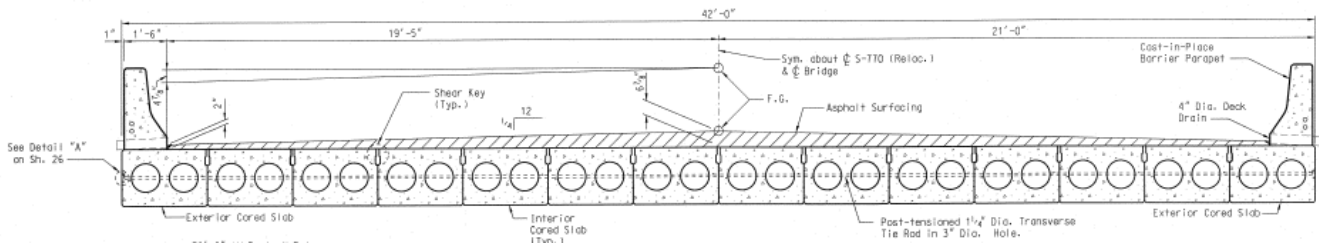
Section Cut through Hollow Core Slab Units (Spans 2 and 3)
